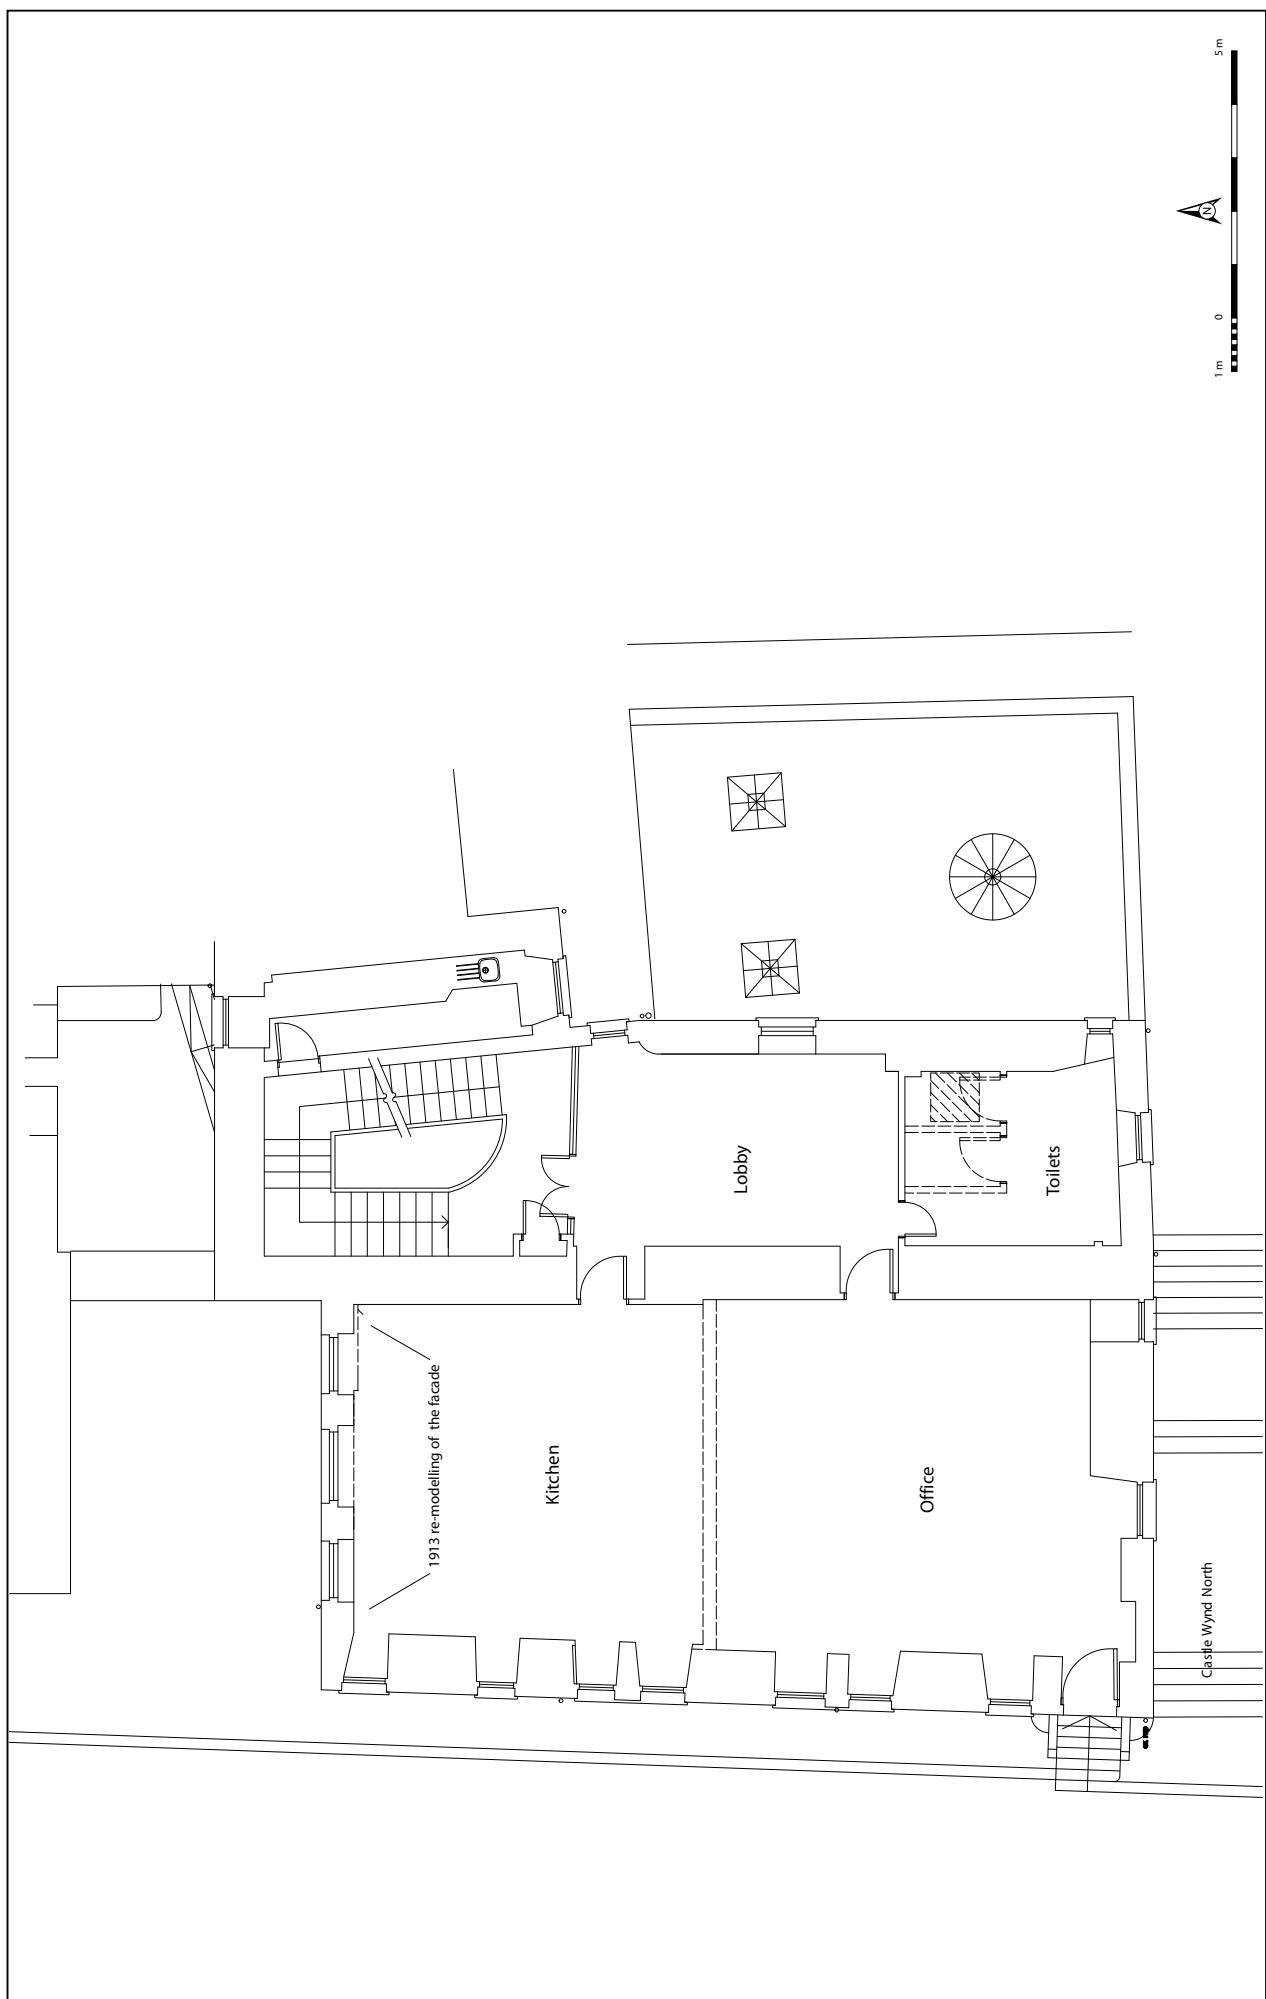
Cannonball House, ground floor plan (plan supplied by client)
